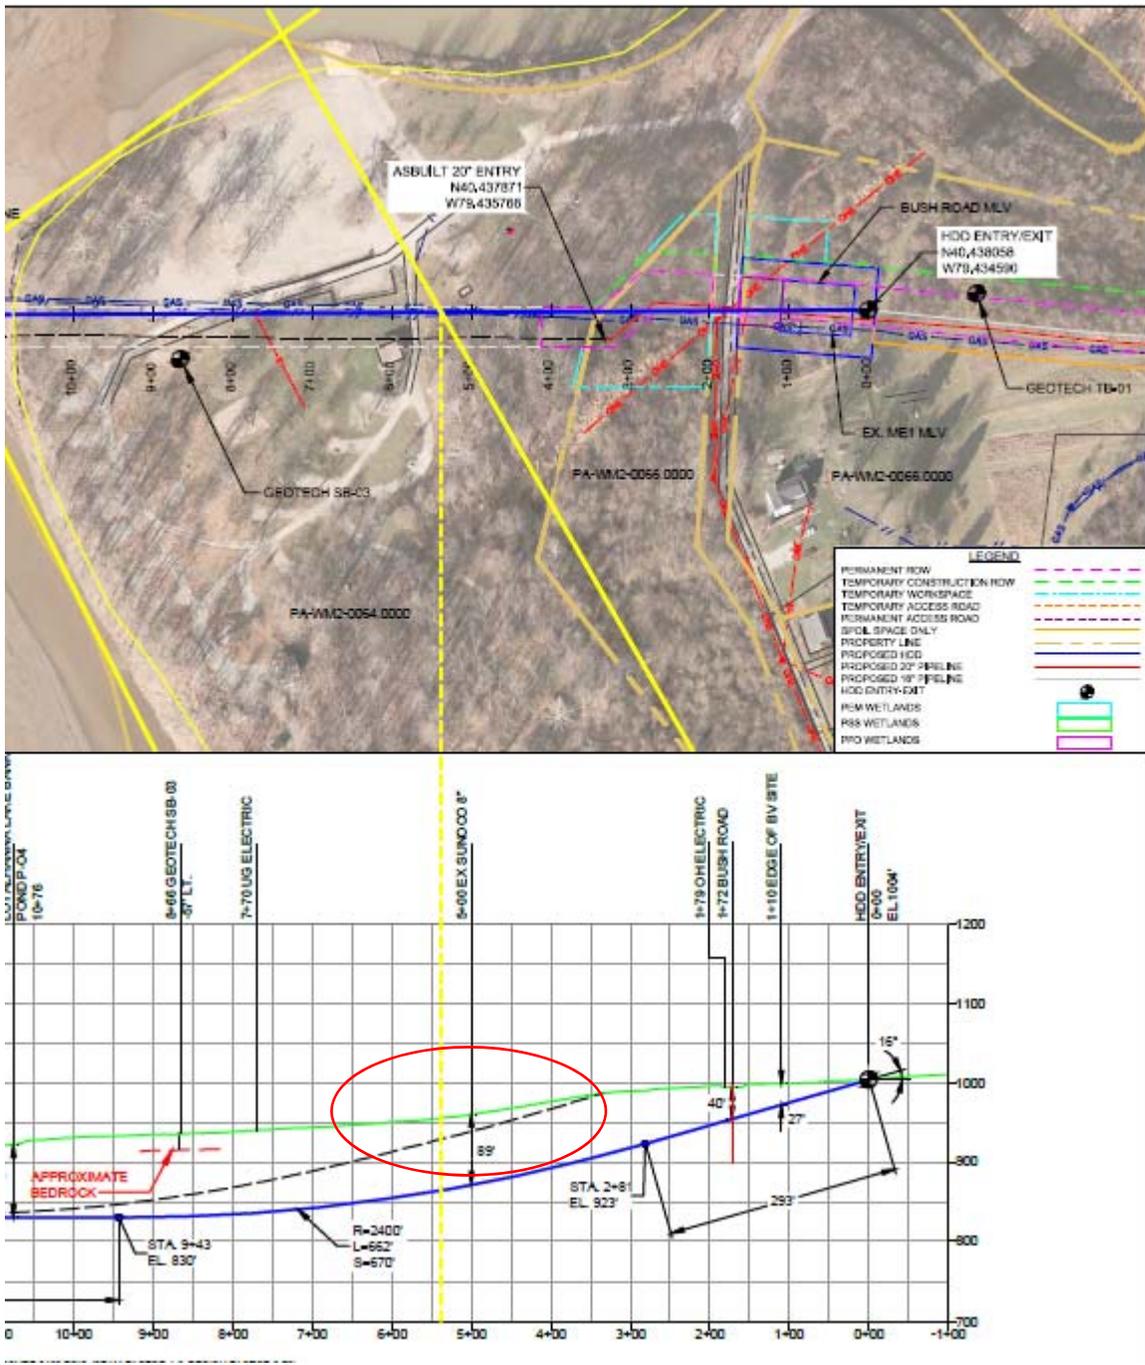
Portion of HDD S2-0010-16 Plan and Profile showing steepening of slope (red ellipse on profile)
